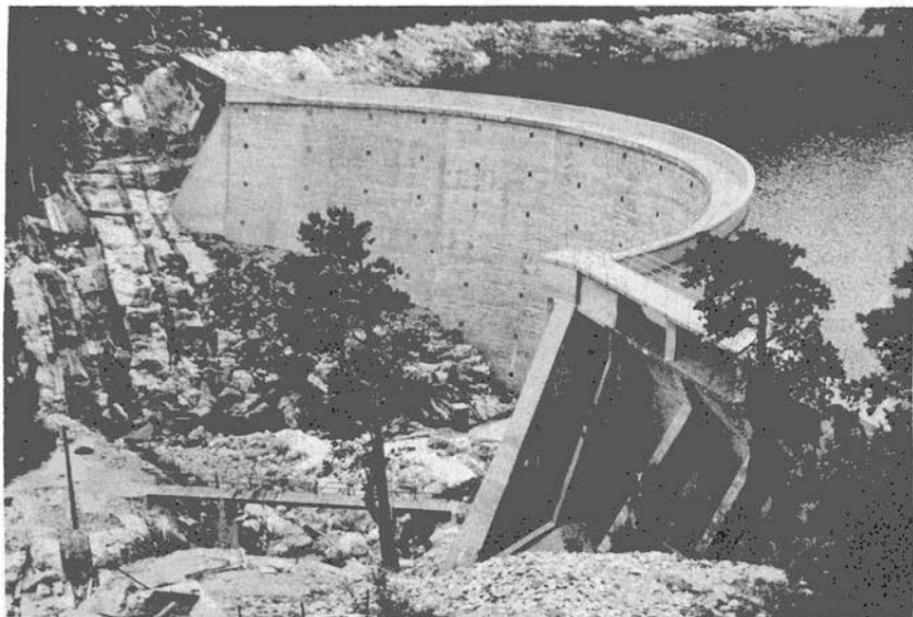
Typical Norwegian concrete arch dam for U-shaped valley is Vatnedal, 98 ft (30 m) high. Note central arch with short constant-angle radius and side sections of flat-slab and buttress construction. In photo, note windowed insulating wall on downstream face, also buttress supports for side section in foreground.
